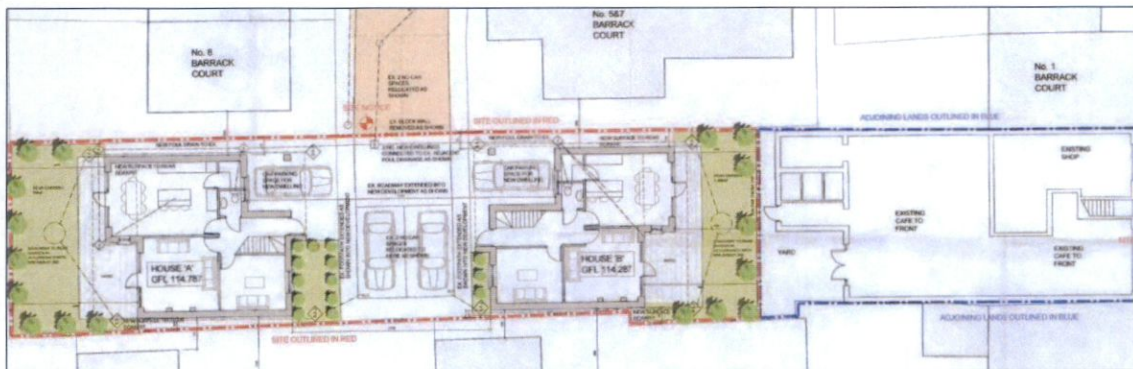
Site layout plan refused under Reg. Ref. SD18A/0138 and ABP Ref. 302075-18.
